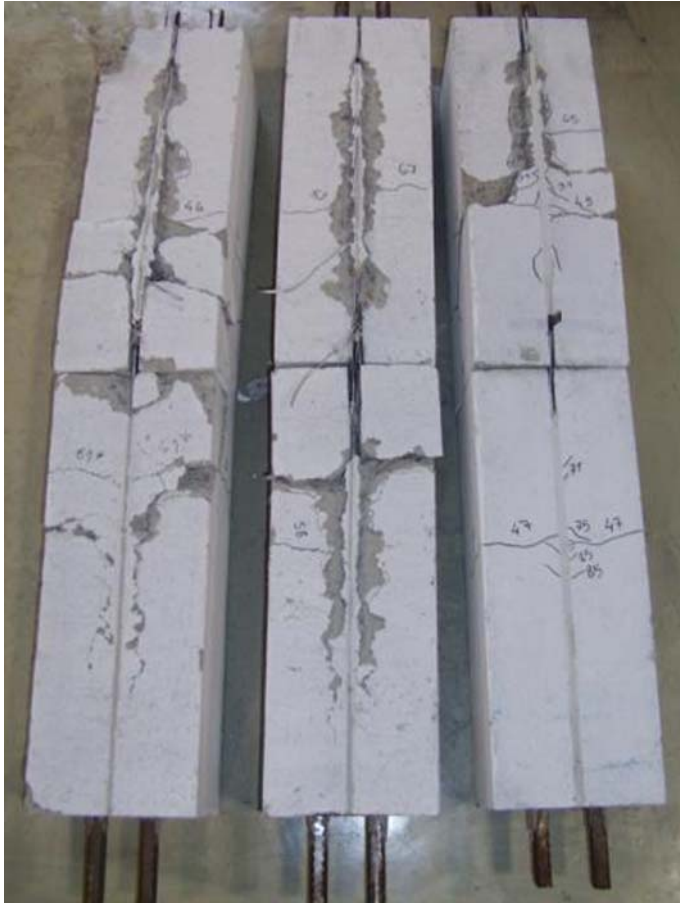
Typical failures of NSM specimens with varying degrees of concrete damage.
